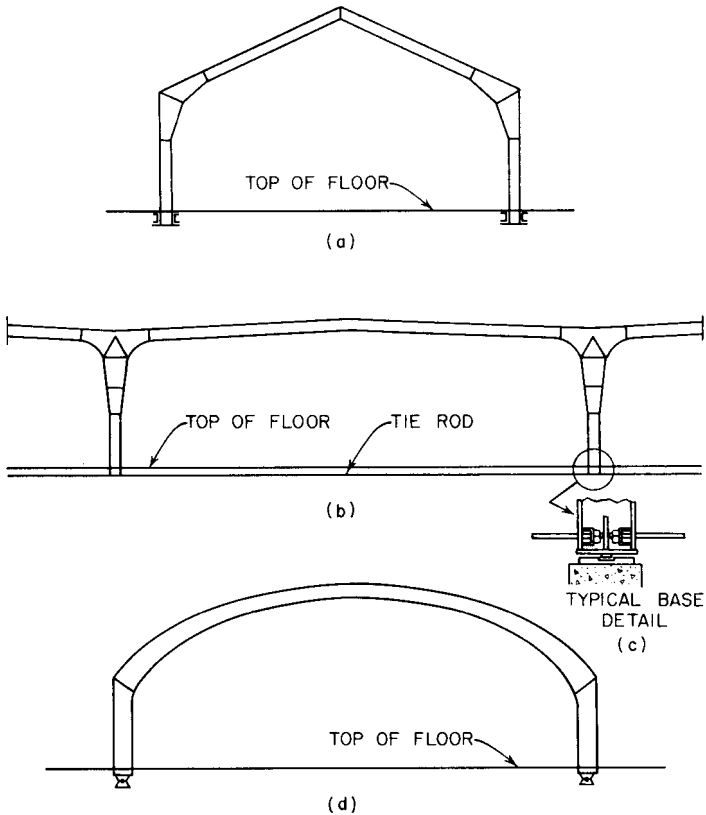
Steel rigid frames: (a) single bent; (b) continuous frame with underfloor tie; (c) connection of tie to a column; (d) with two-hinged.
